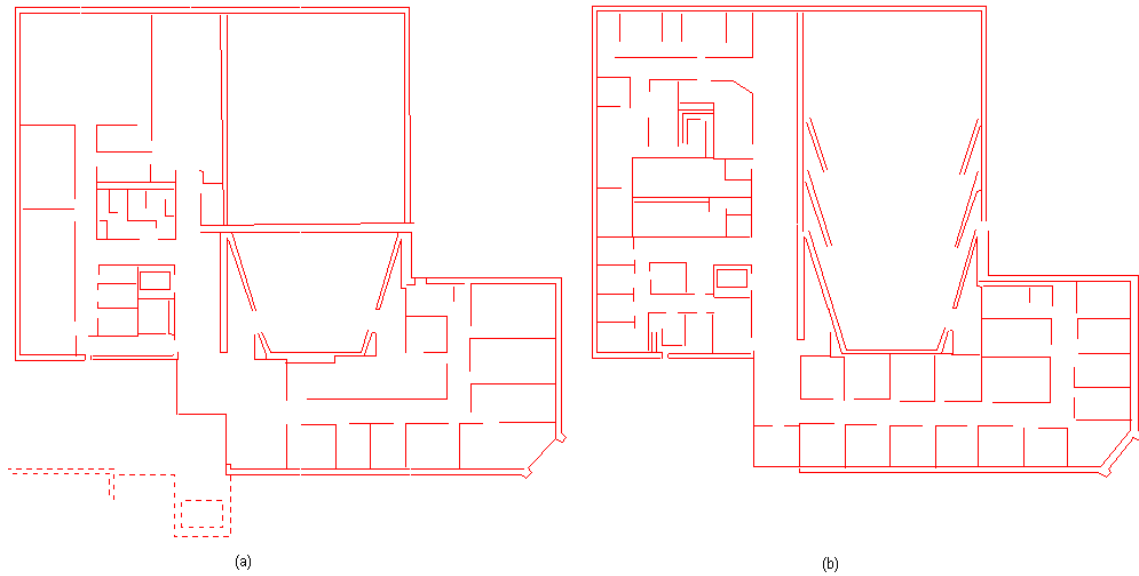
Floorplan of Fuller Laboratories, WPI, Worcester, MA.(a) First floor (b) Second Floor
